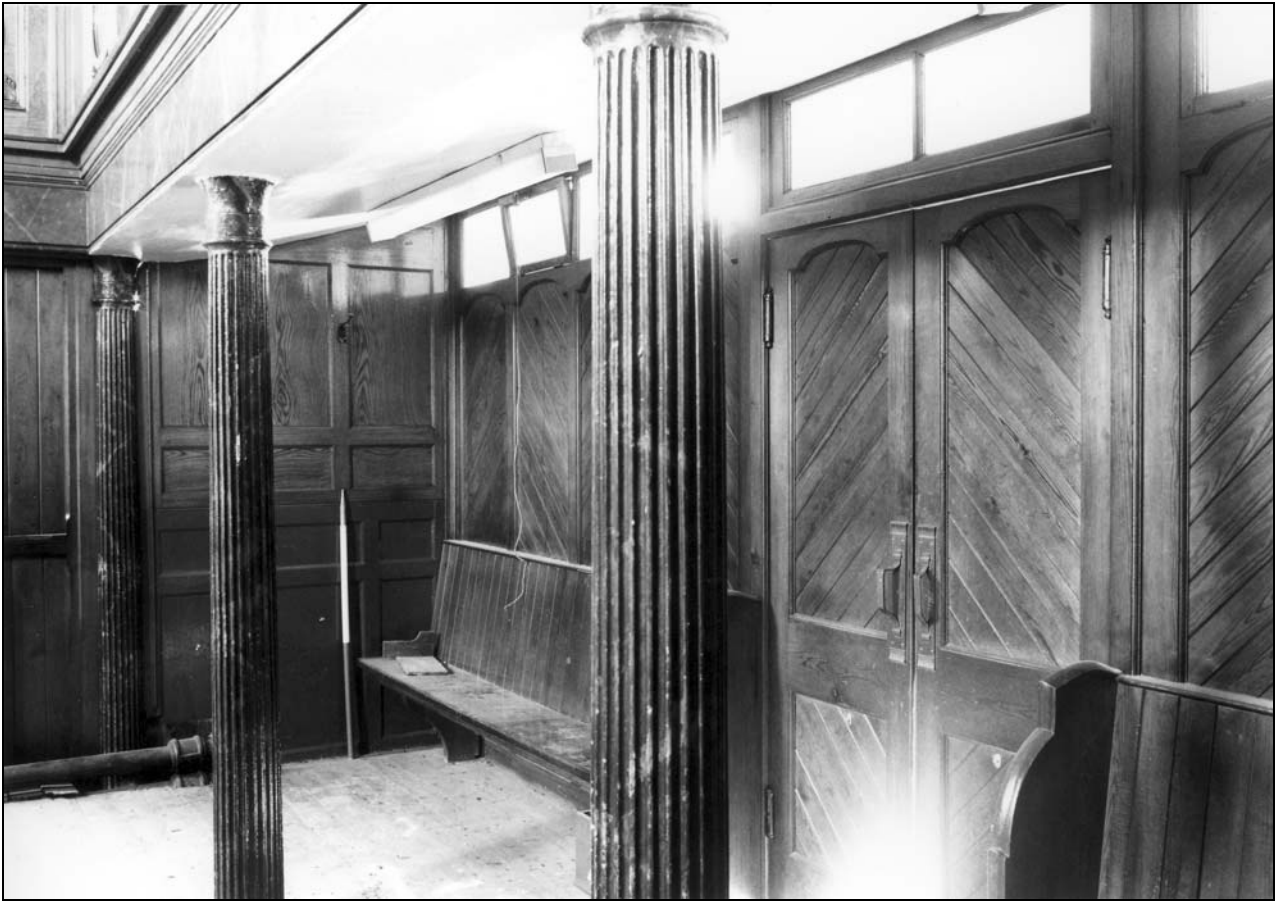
South-east corner of main room, with columns supporting gallery (film 2, frame 1)
